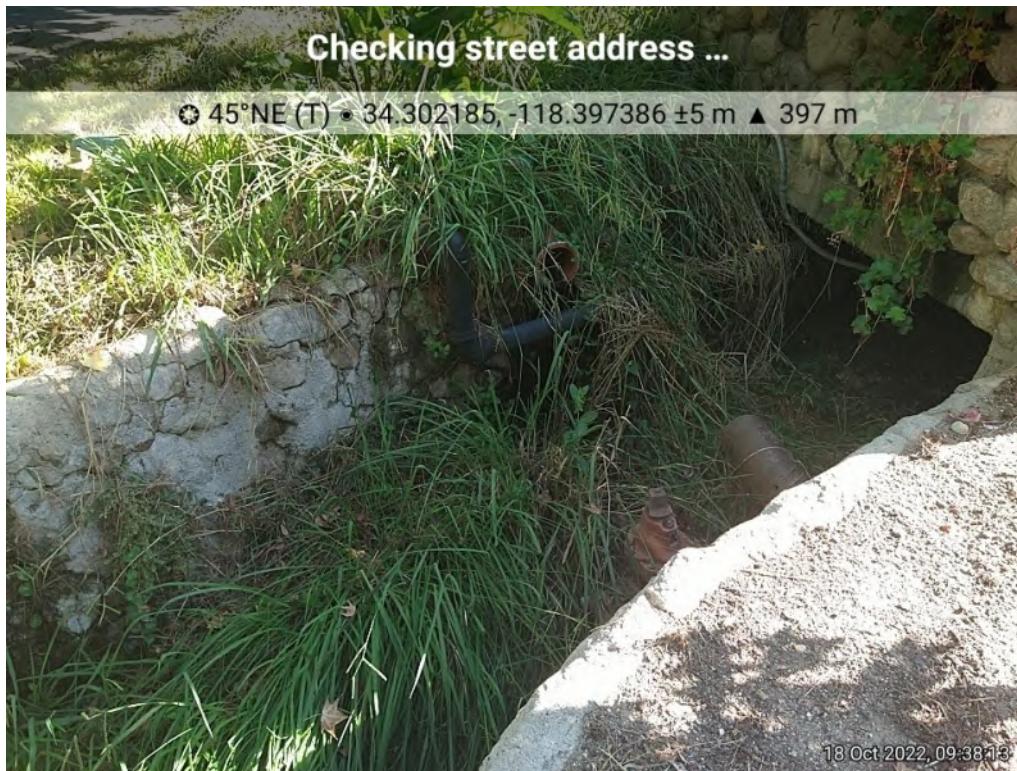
View of unnamed ephemeral channel #2 where it traverses under a property driveway just to the southwest of the project site, facing northeast.
